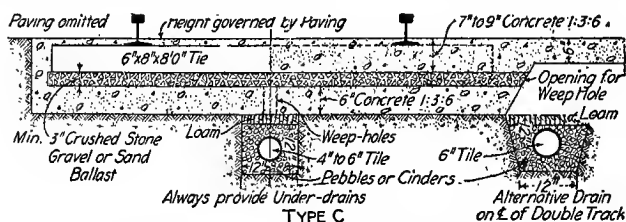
TYPE C—CONCRETE SLAB SUB-BALLAST TRACK CONSTRUCTION
